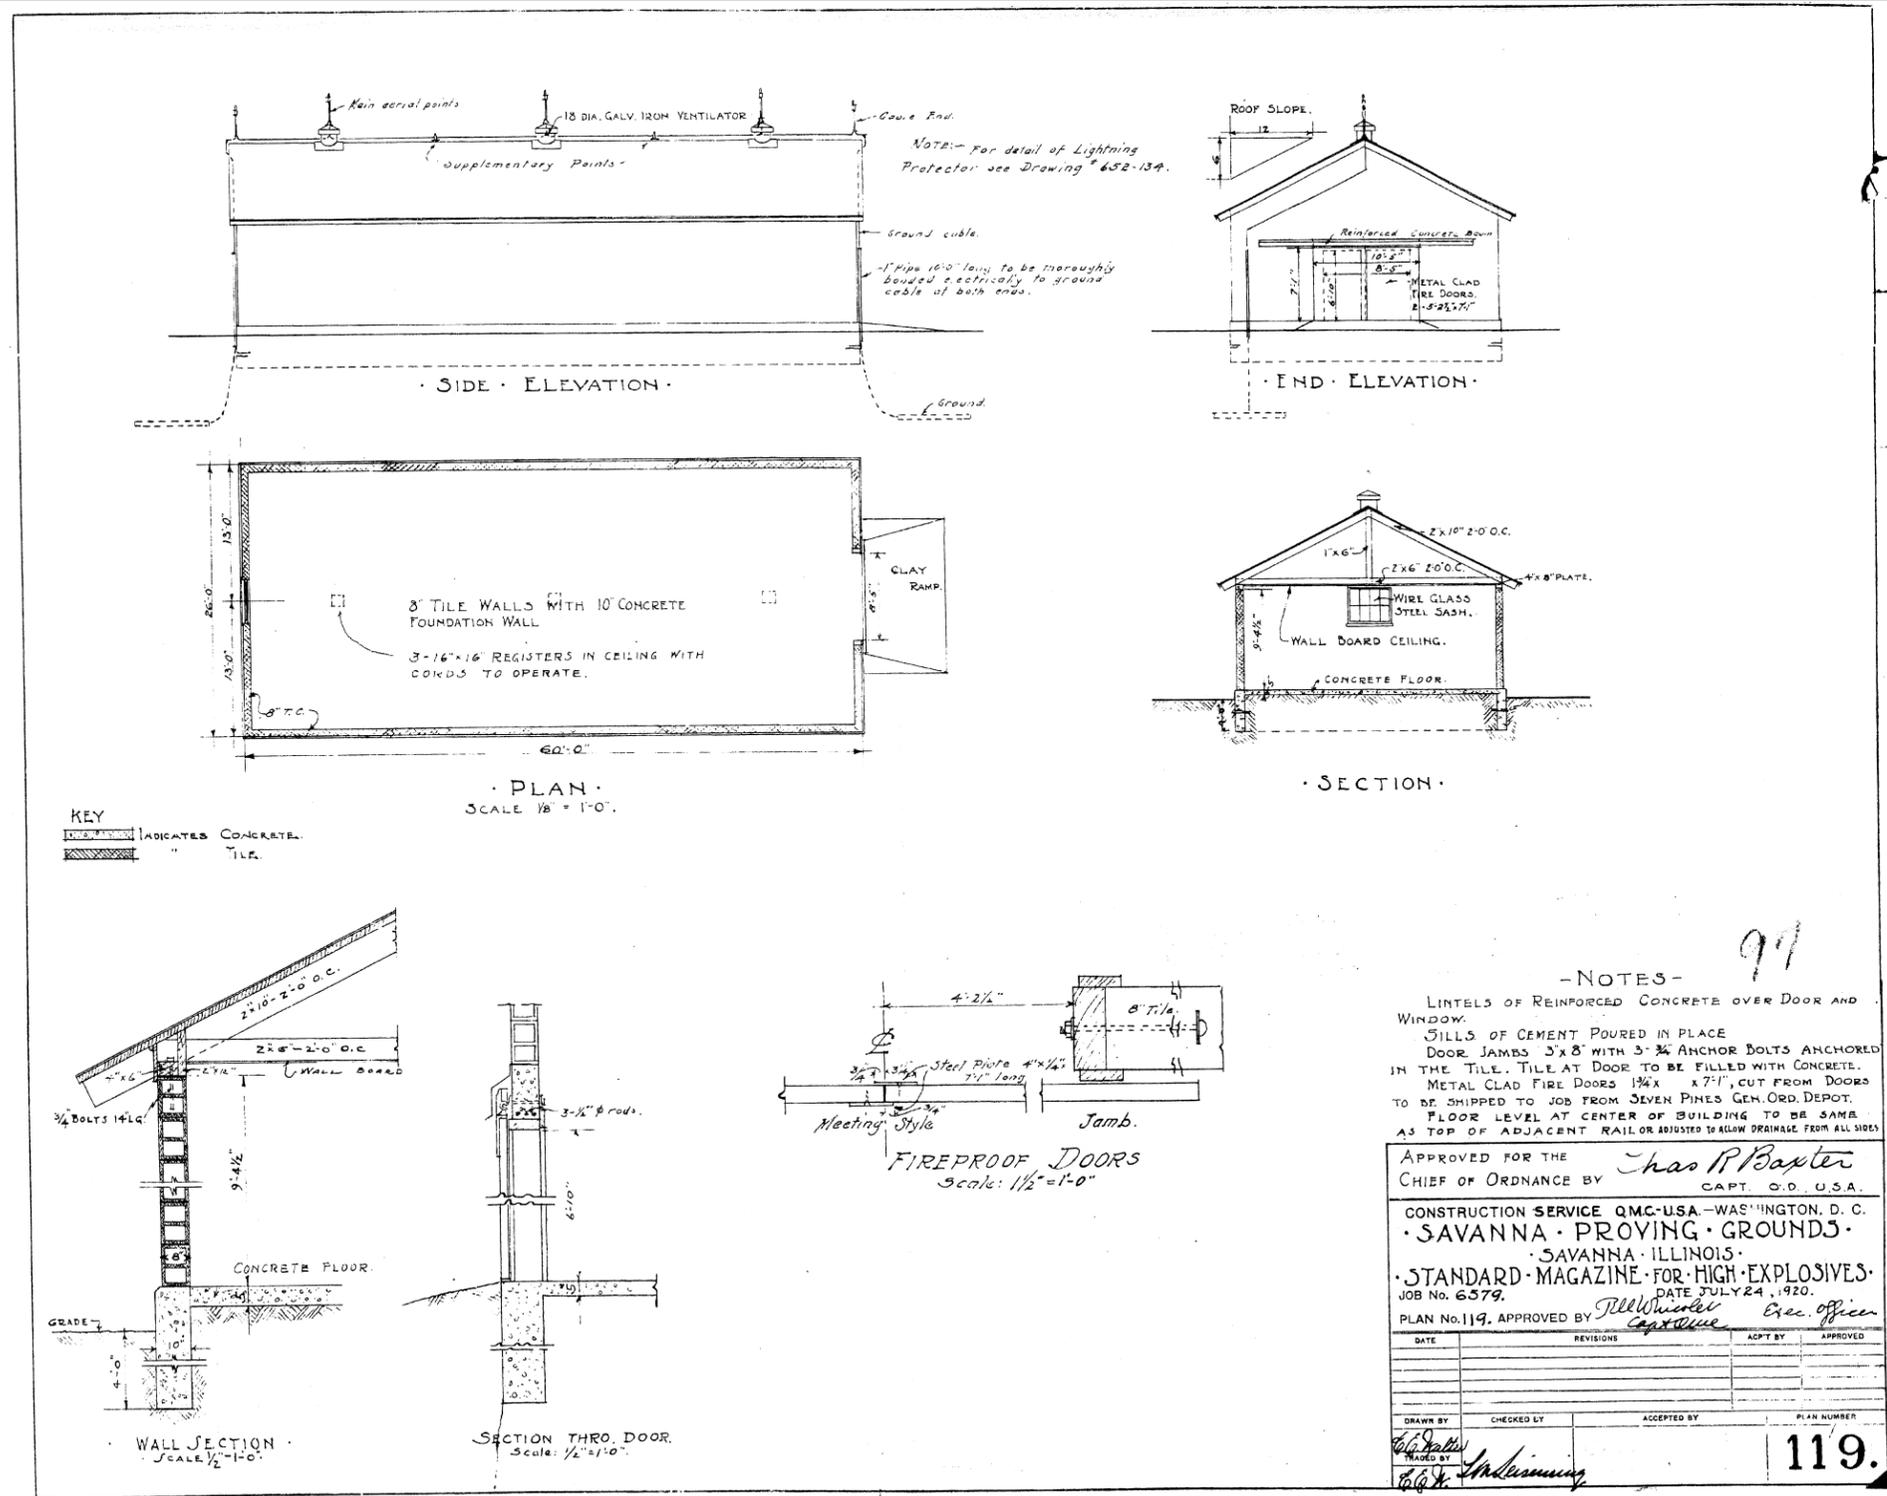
Plans and elevations for standardized aboveground magazine for high explosives.
